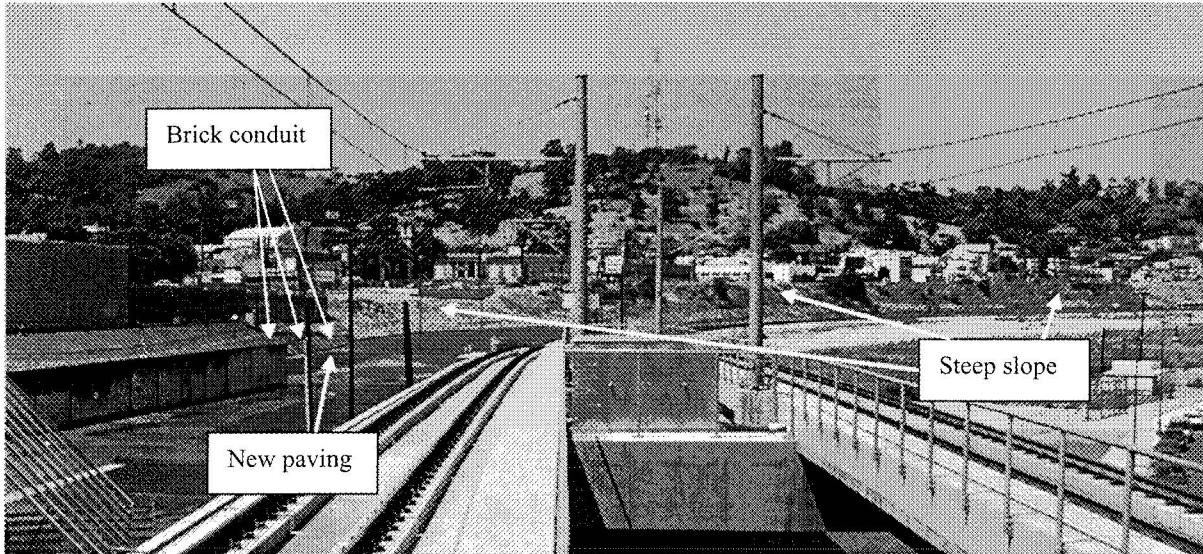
View north to Elysian Hills showing Gold Line platform, newly paved area and locations of exposed brick conduit.
